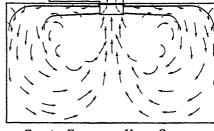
Elevation View, Ceiling Supply Outlet with Return Opening in Wall
